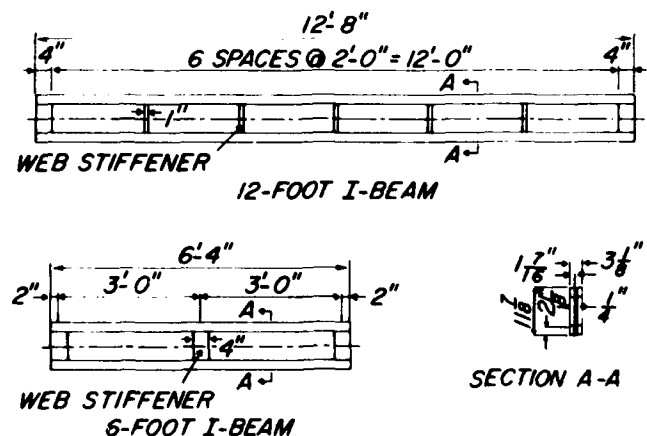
Details of the 6-foot and 12-foot I-beams used in this study. (M143780)
